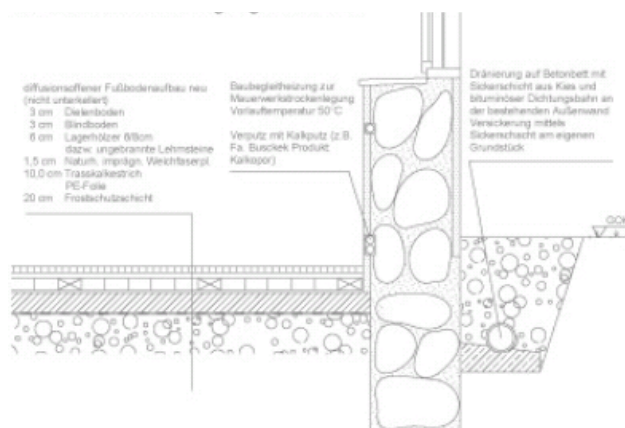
AlpHouse pilot-building Tennengauer Einhof in Kuchl, wall tempering system, by BAUakademie Lehrbauhof Salzburg
